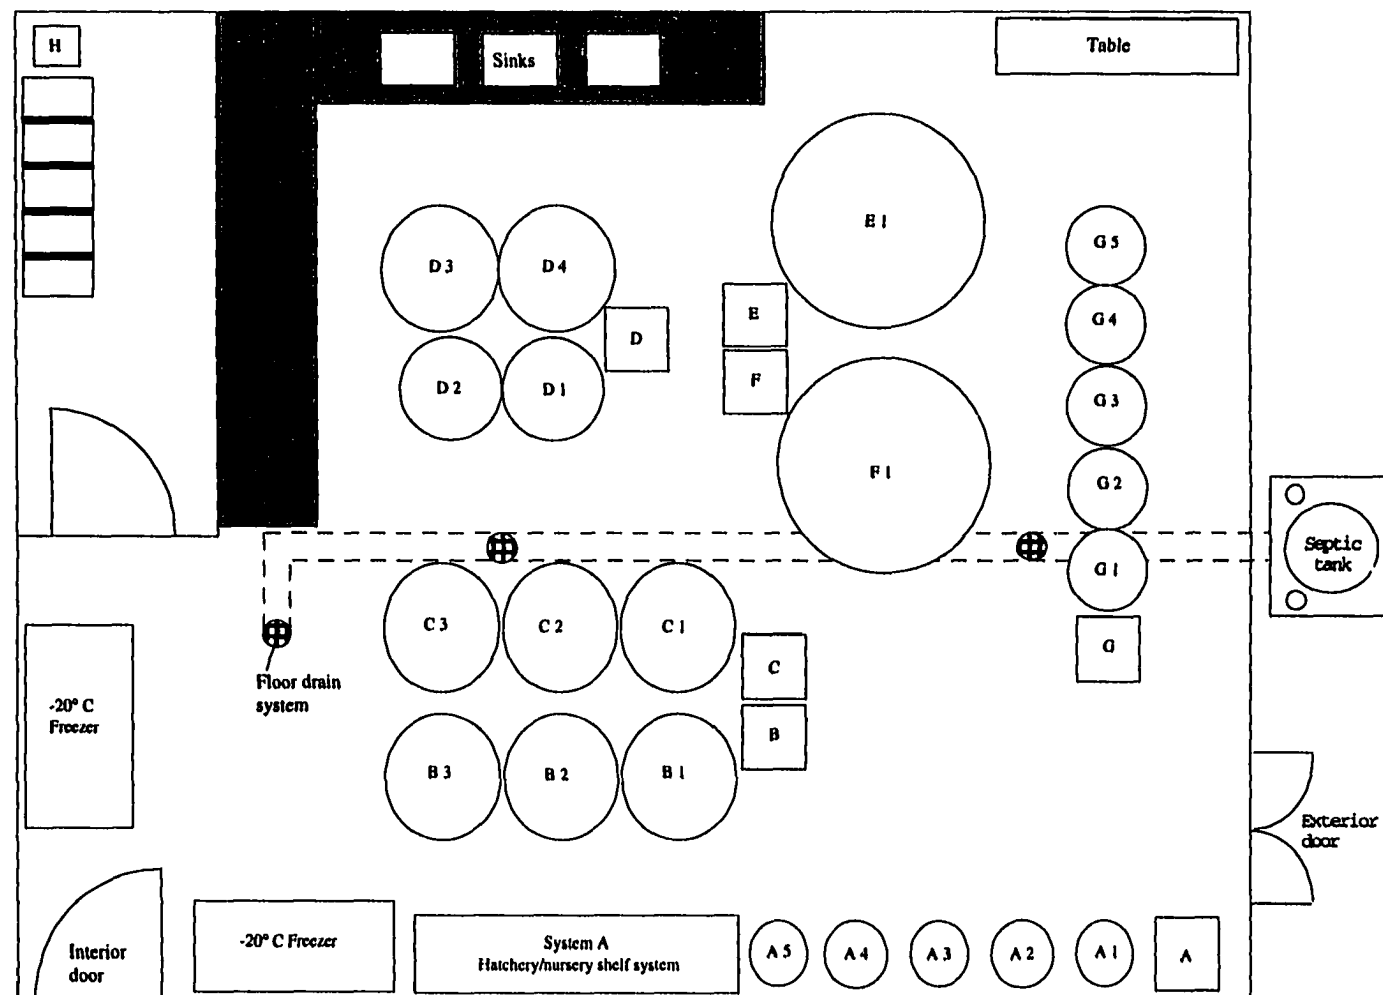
Floor plan of the Transgenic Laboratory detailing layout of recirculating systems used to maintain transgenic channel catfish and the floor drain system.
